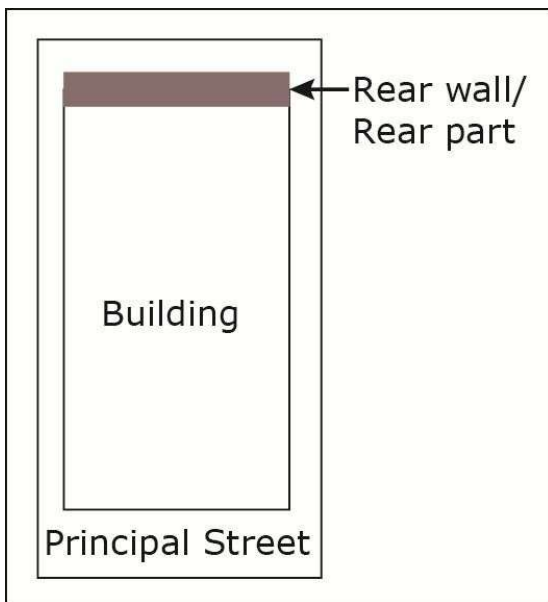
Modifications/alterations and associated demolition to rear walls or rear part of contributory or not contributory buildings.
